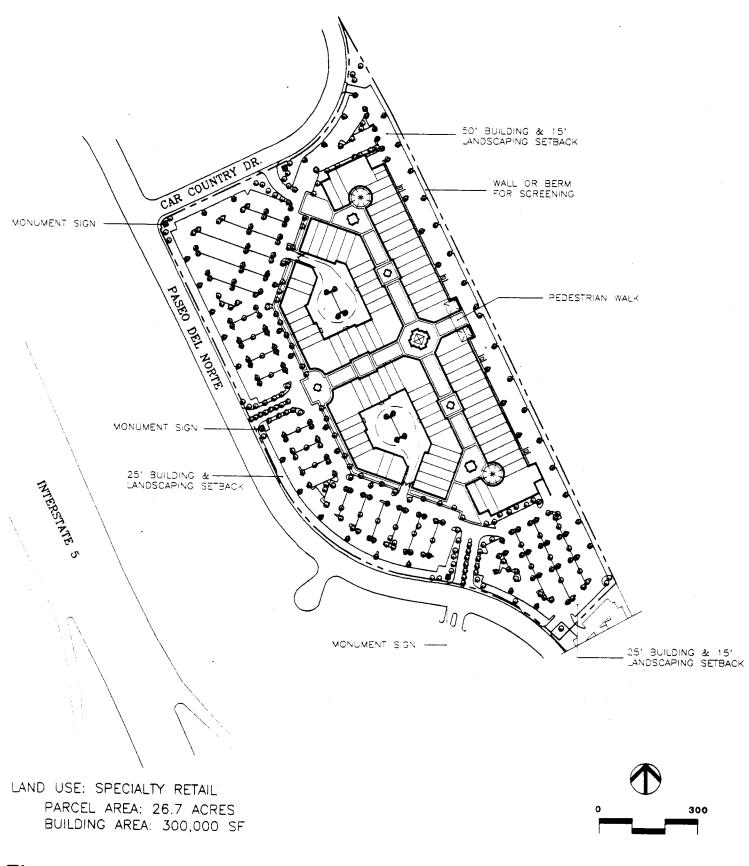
PLANNING AREA 6 SPECIALTY RETAIL
